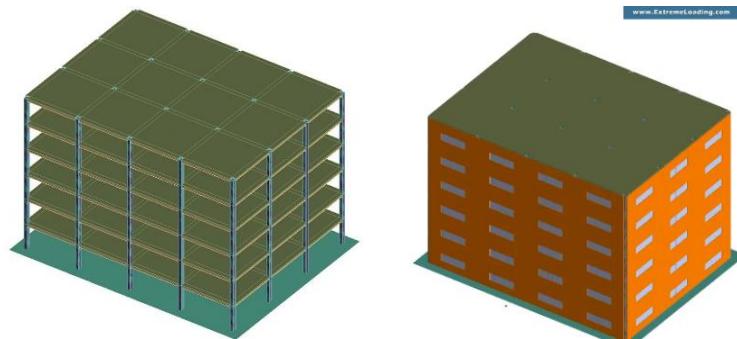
Structural skeleton of the reference building (left) and exterior cladding (right).
